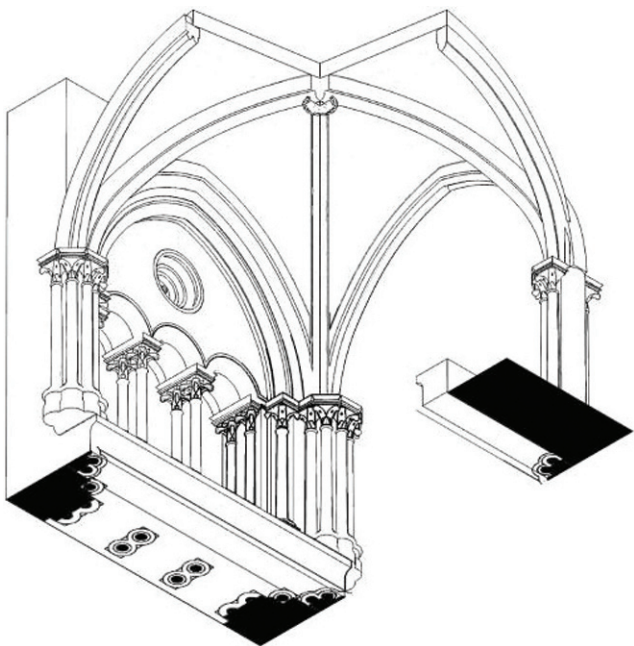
Axonometric rendering of the bay, synthesizing plan, and section.
